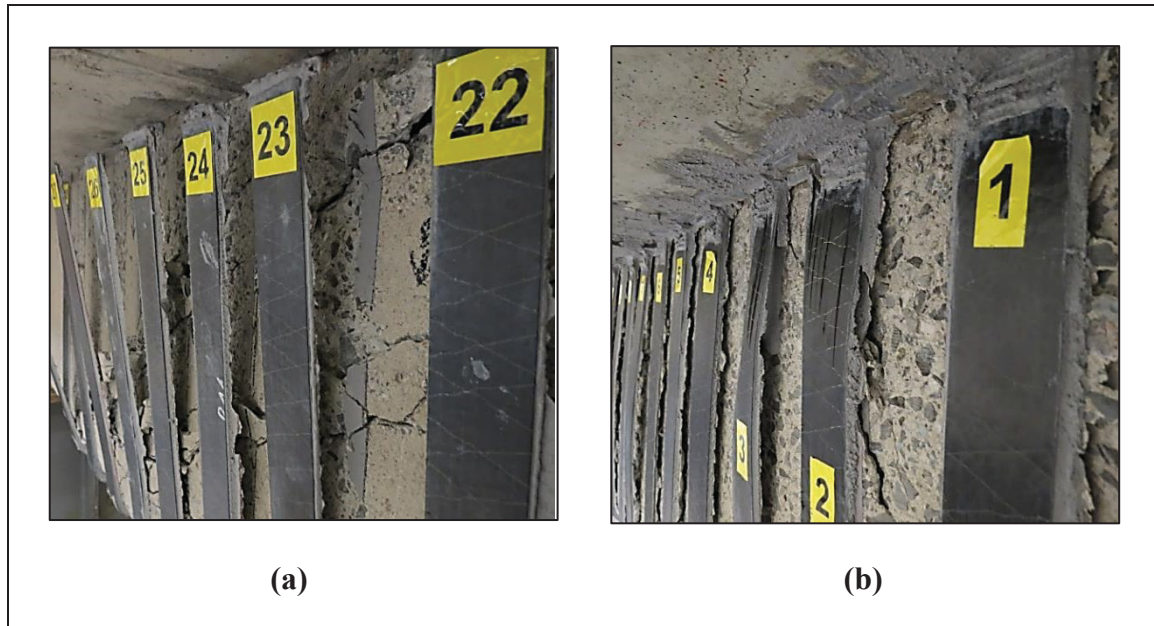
State of laminate: (a) Debonding of laminate in specimens with no anchorage; (b) Local debonding without anchorage pullout of laminate in anchored specimens
